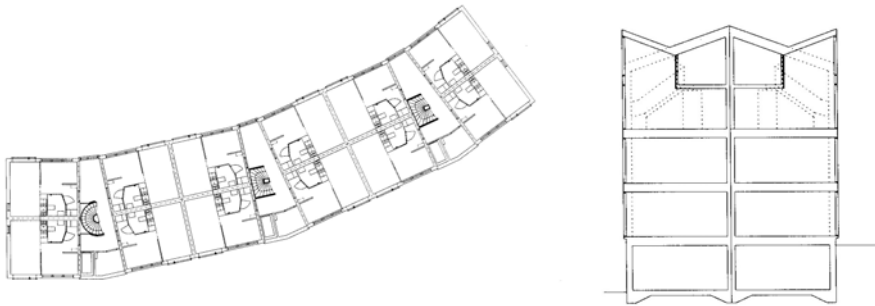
Layout for Vetenskapsstaden I, 1st and 2nd floor and section.
